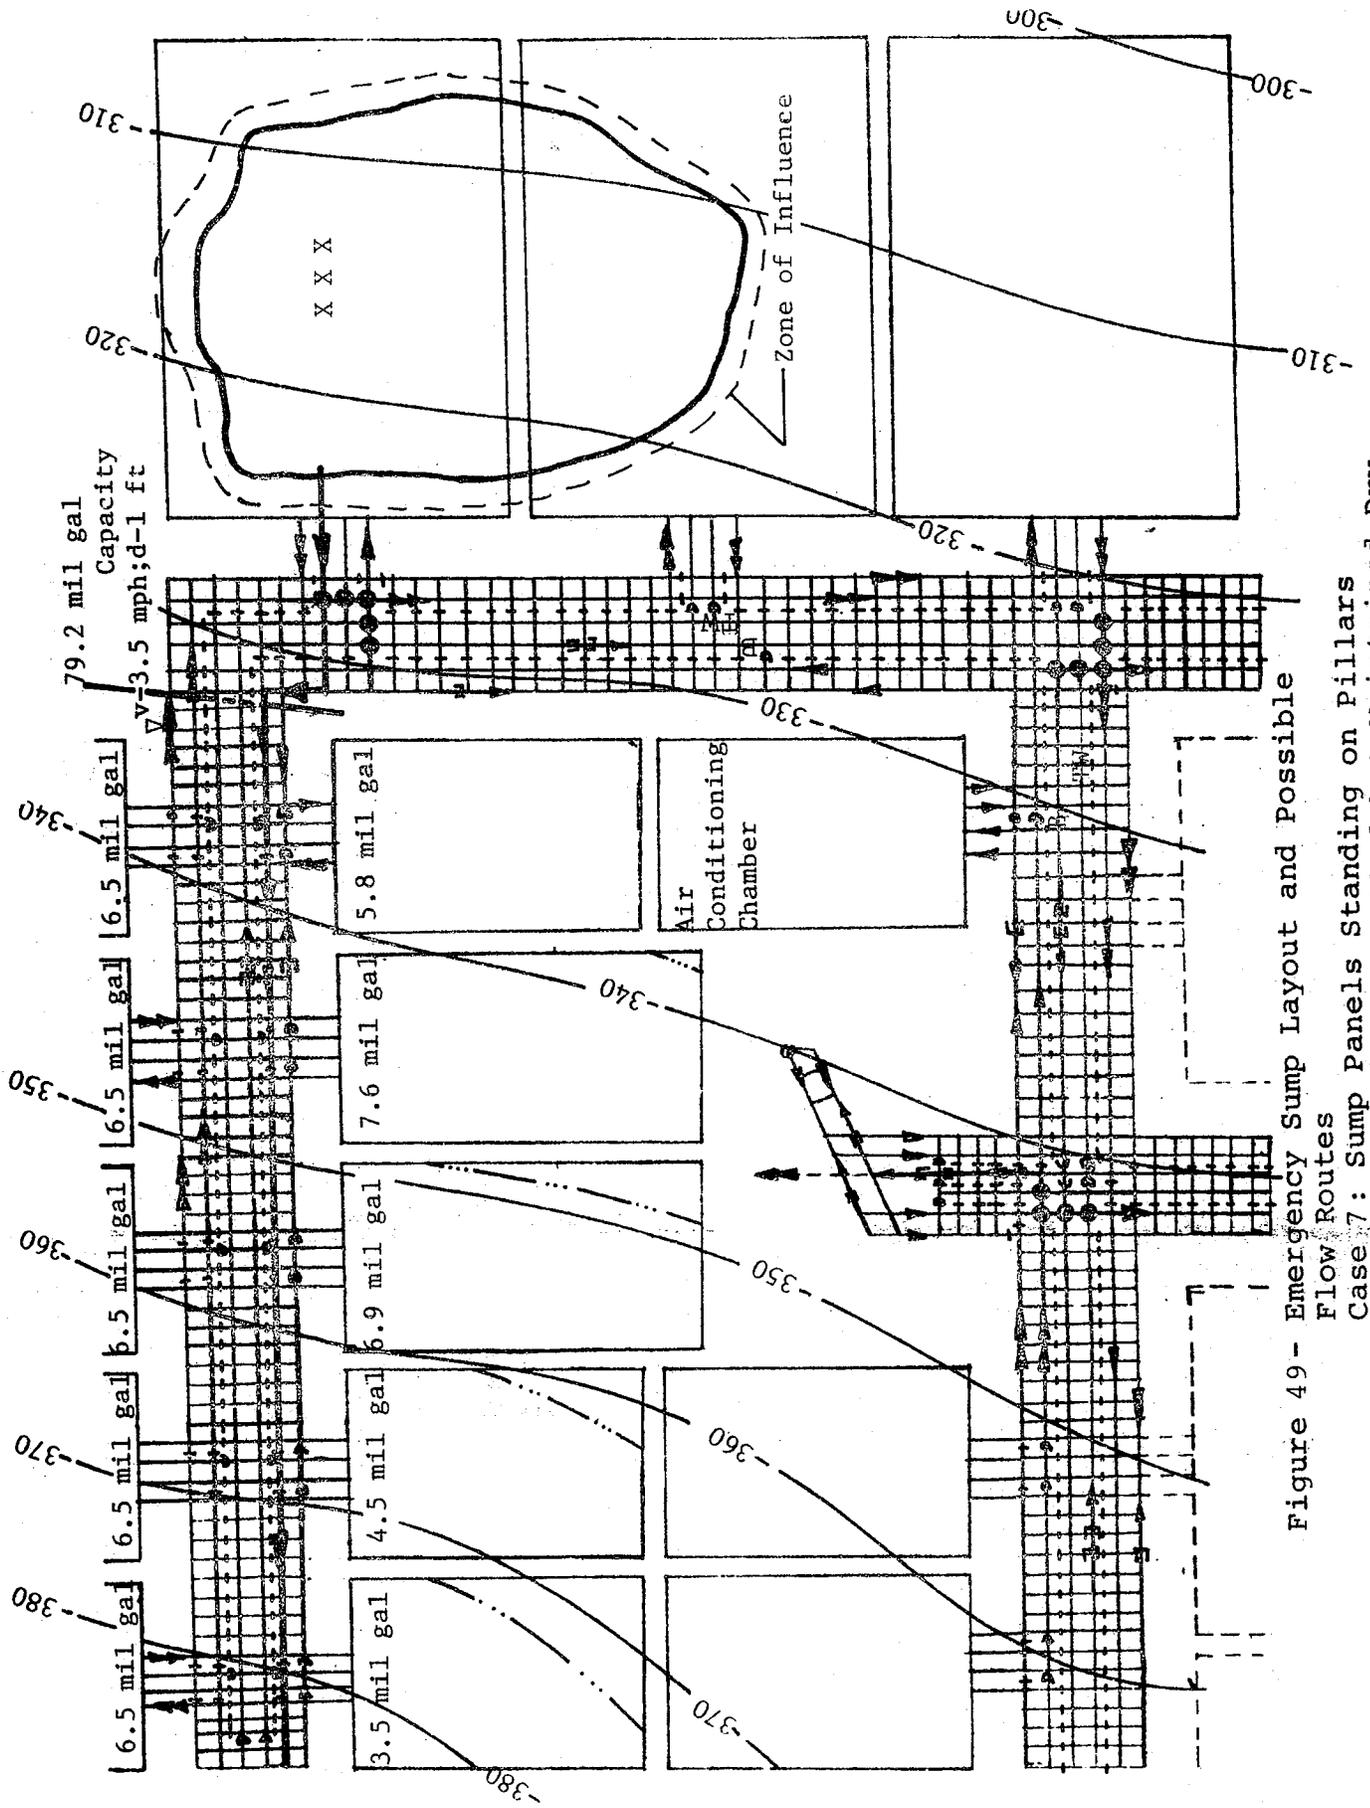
Emergency Sump Layout and Possible Flow Routes
